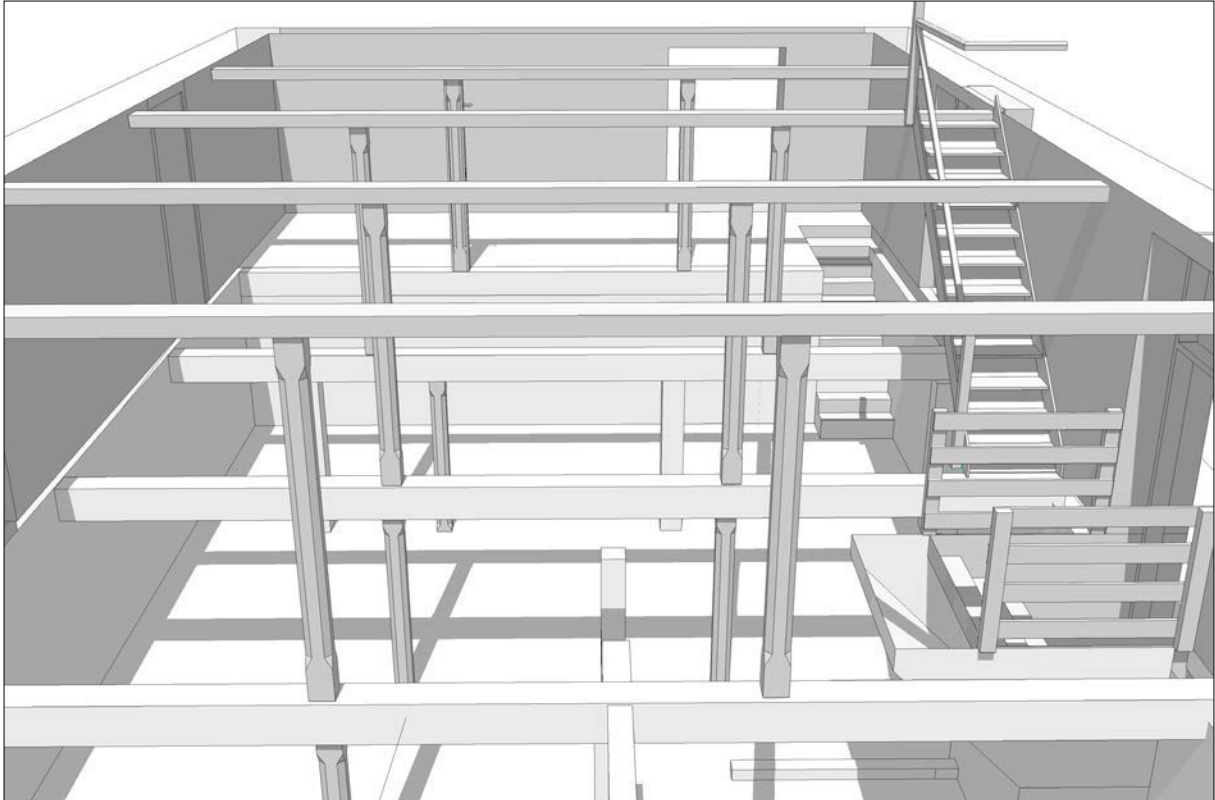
South warehouse - arrangement of beams and piers in basement and on ground floor -perspective view
